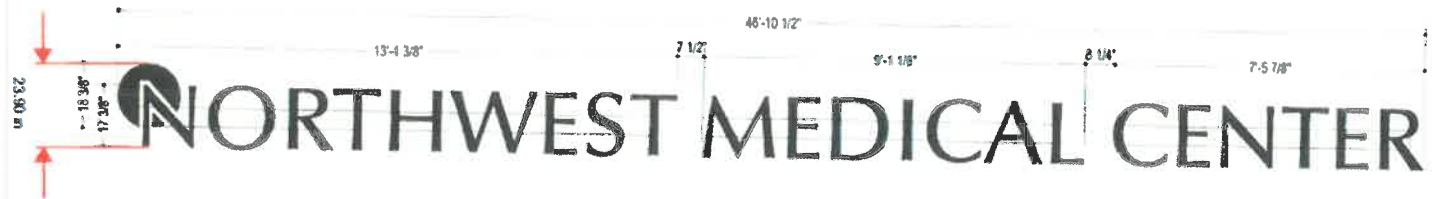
East Elevation-Proposed Northwest Medical Center (Secondary ID sign)
